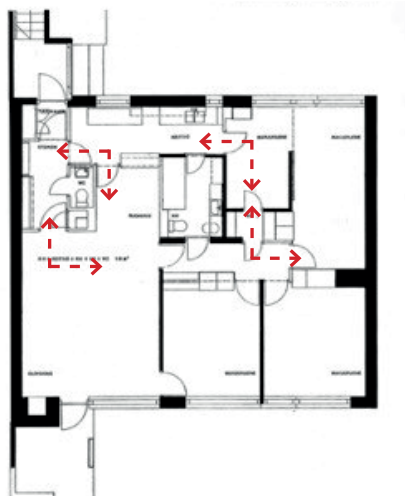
FIGURE I. Examples of possible changes in direction of movement. Plan layout by Pietilä, Suvikumpu, 1970.
